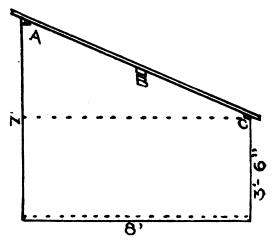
HOGHOUSE AND FEEDING FLOOR (SECTION).
